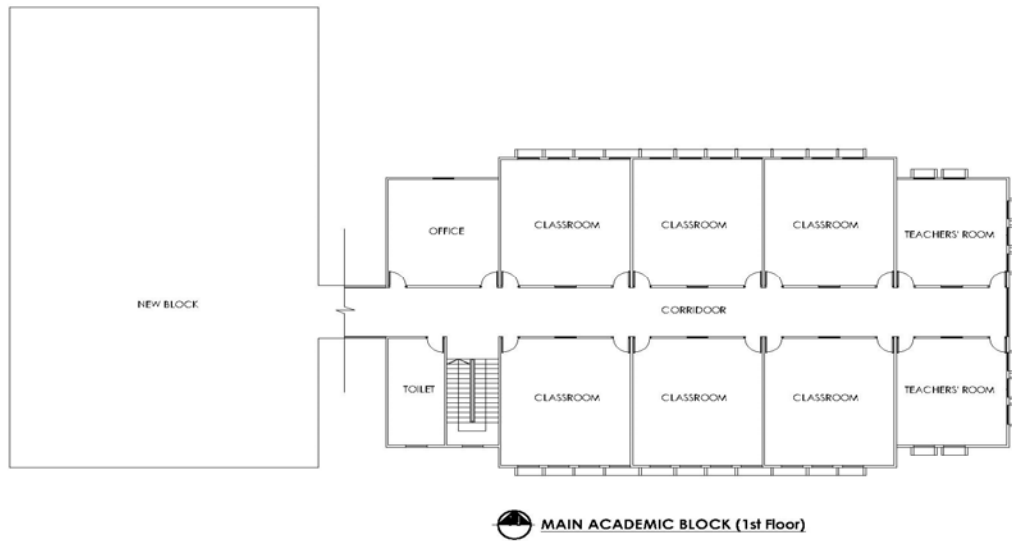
Floor plan of Govt. Laboratory High School (main academic block)
